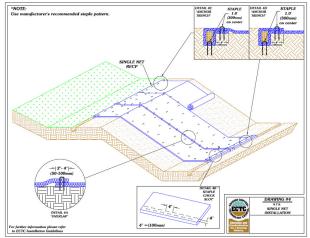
Downslope RECP Anchoring (ECTC 2014)
